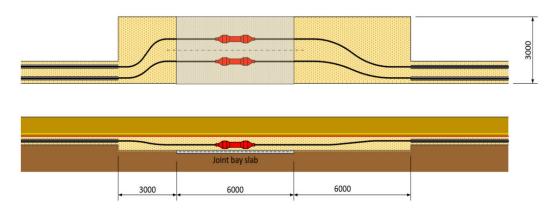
Typical Joint-Bay Dimensions (source: WSP | not to scale)
